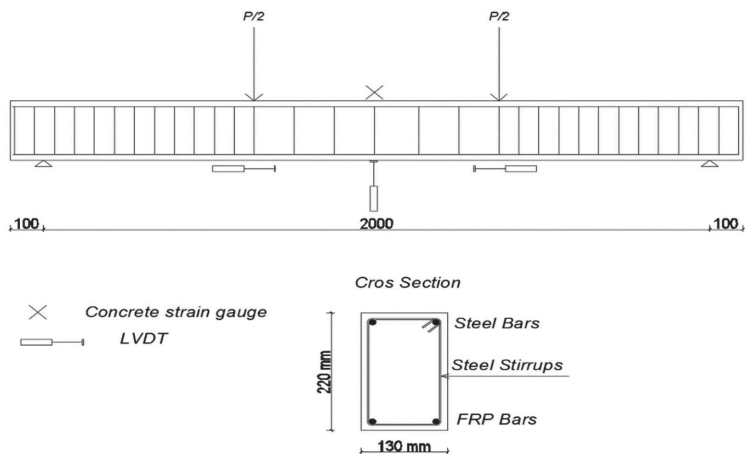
Beam details, instrumentation, and geometrical parameters of concrete beams
